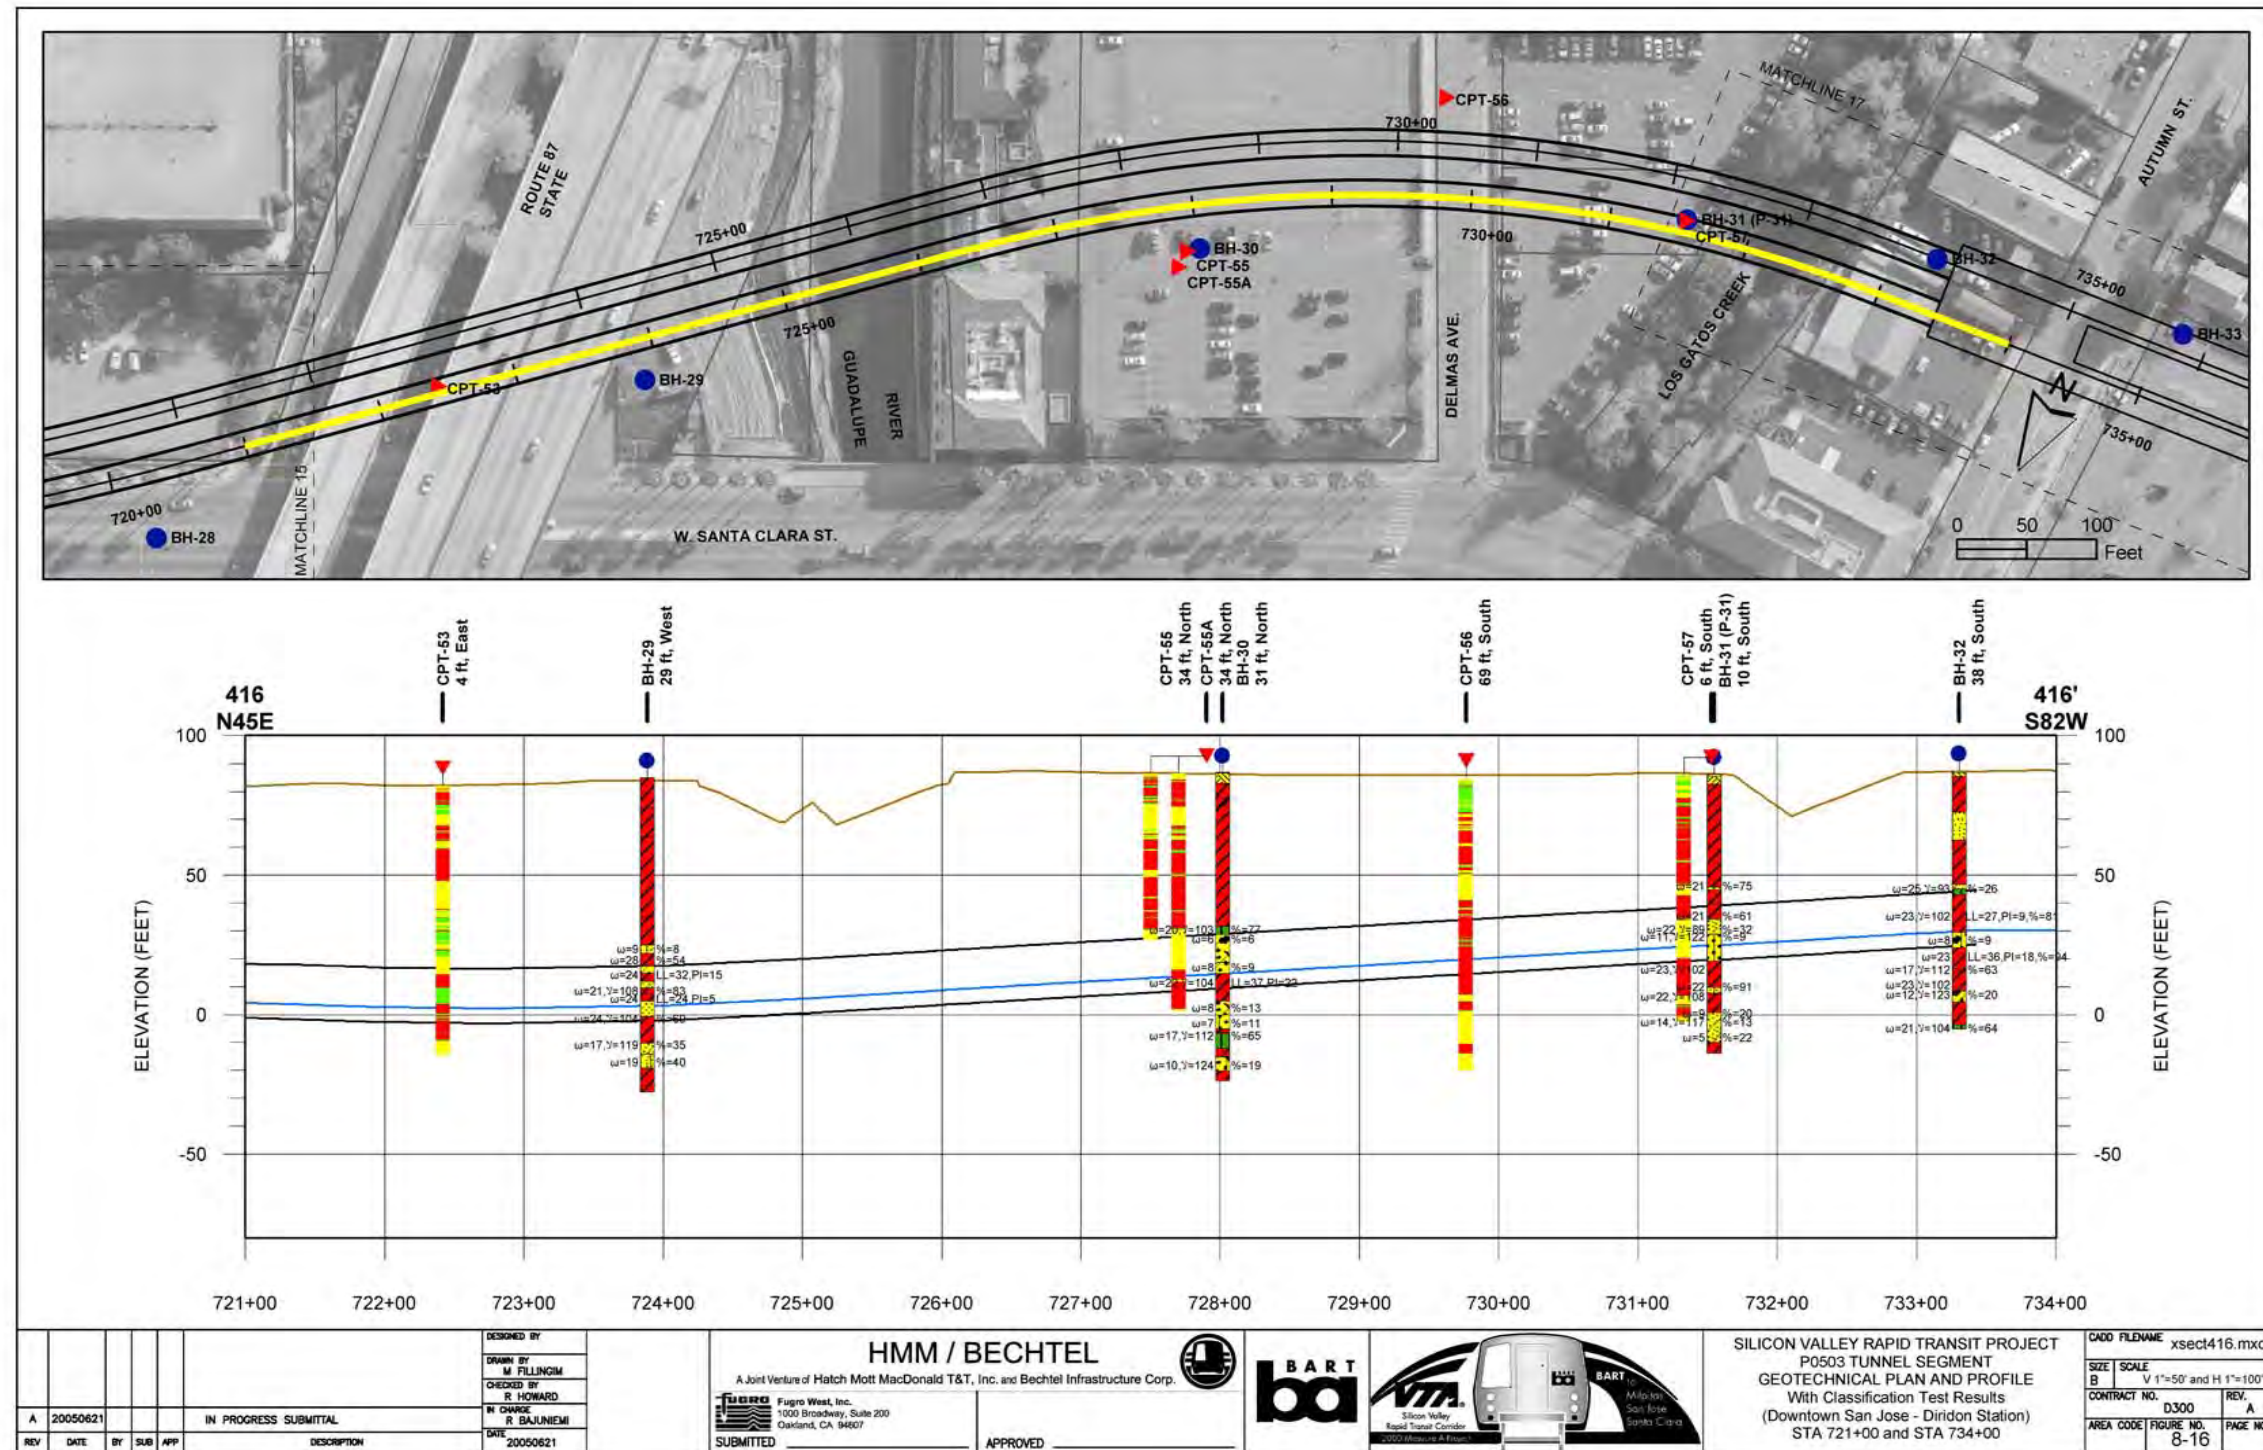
Geotechnical Plan and Profile with Classification Test Results: Station 721+00 to 734+00.
